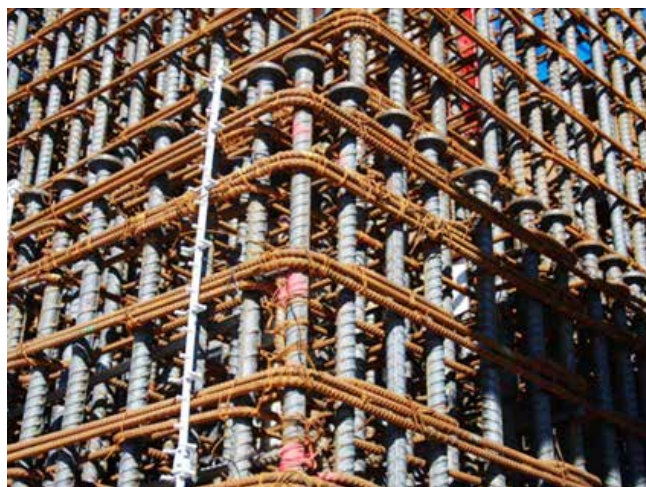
An example of a shear wall reinforcing cage that has been detailed for constructability. (Image courtesy of Headed Reinforcement Corp.).
